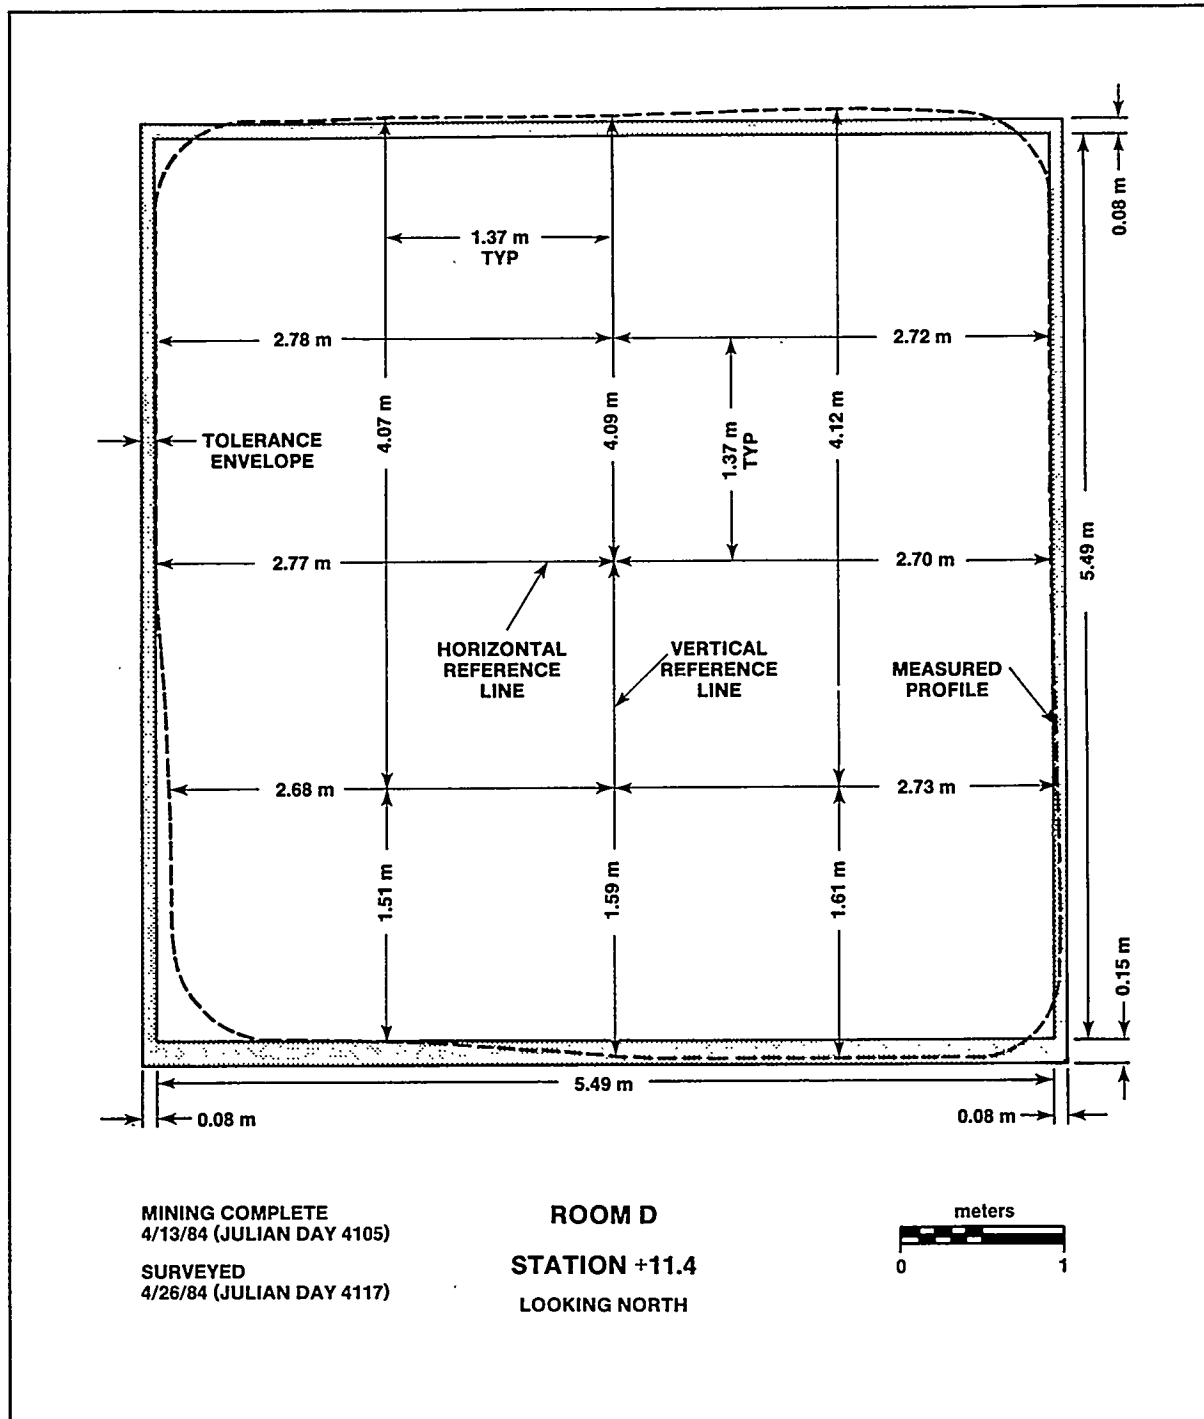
As-Built Cross Section of Station +11.4 m, Room D
